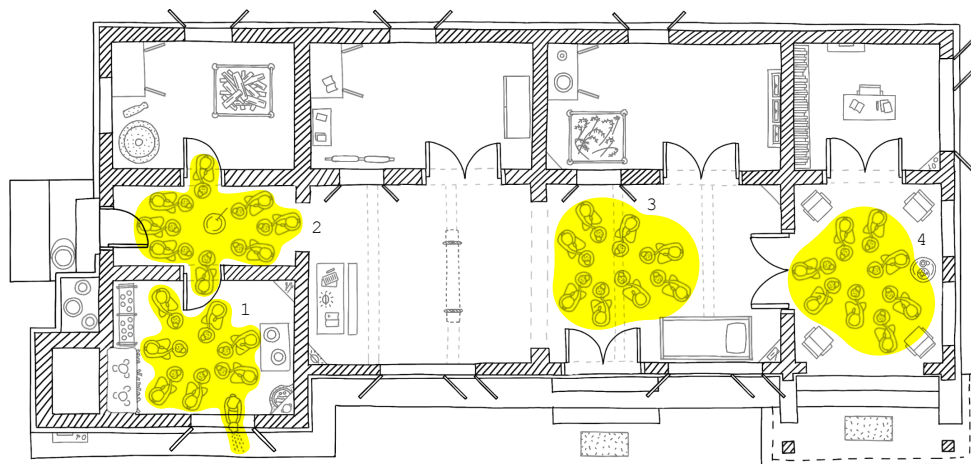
Dining locations in Appa's Jaffna village home. The family typically ate in the kitchen or verandah, in the sitting room on auspicious days, or in the hall when eating *odiyal kool*, a stew made from harvested palmyra sprouts.
